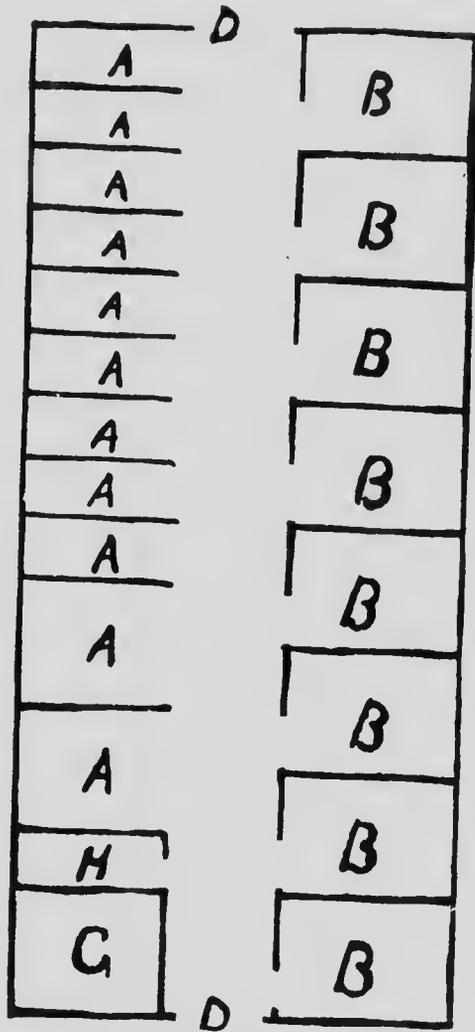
Ground floor plan of a barn for brood mares. A—open stalls; B—box stalls; G—grain; H—tools.
